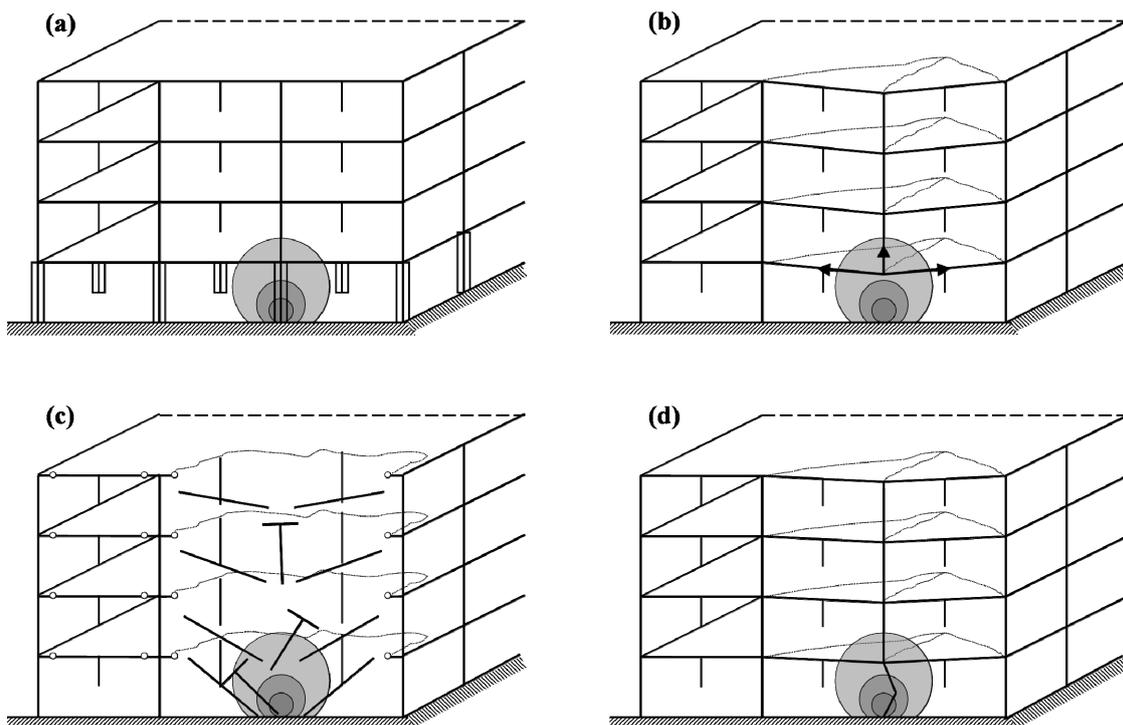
Strategies for robust structures: a) Key element method, b) Alternate load path method, c) Isolation of collapsed region, d) Residual strength method.
